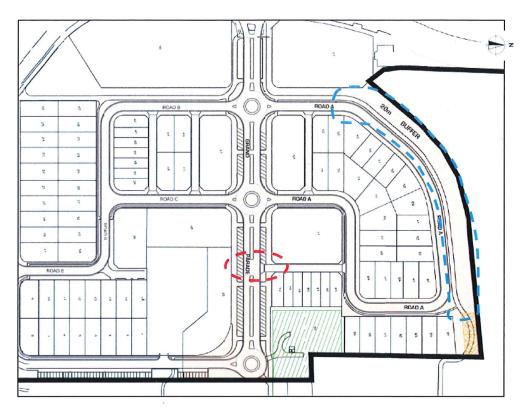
Proposed Road Layout. New northern road shown in blue and location of median extension to prevent right and u turns shown in red (source: Proponent's RTS)
